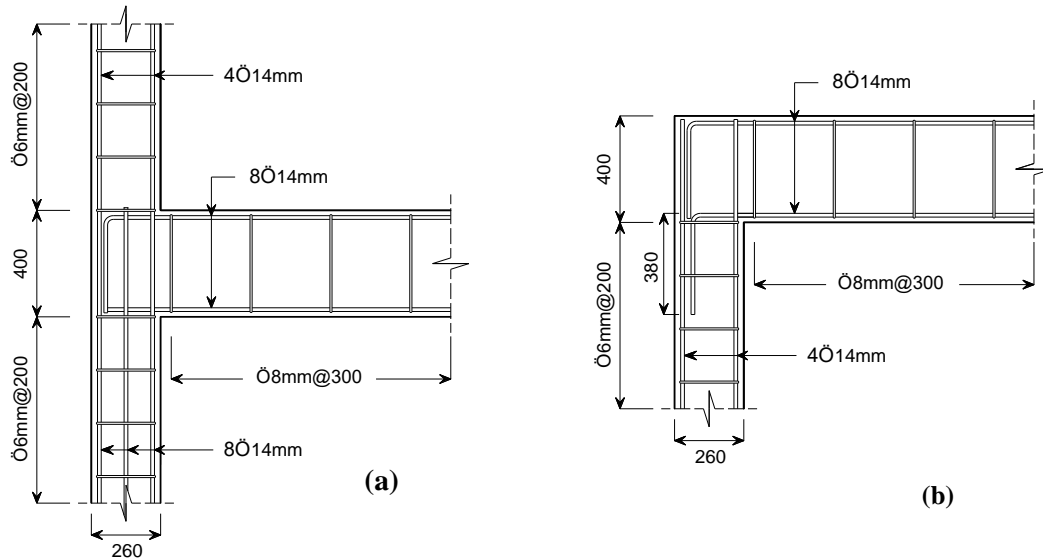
Detailing of reinforcing steel in beam-column joints at (a) 1st storey and (b) 2nd storey.
